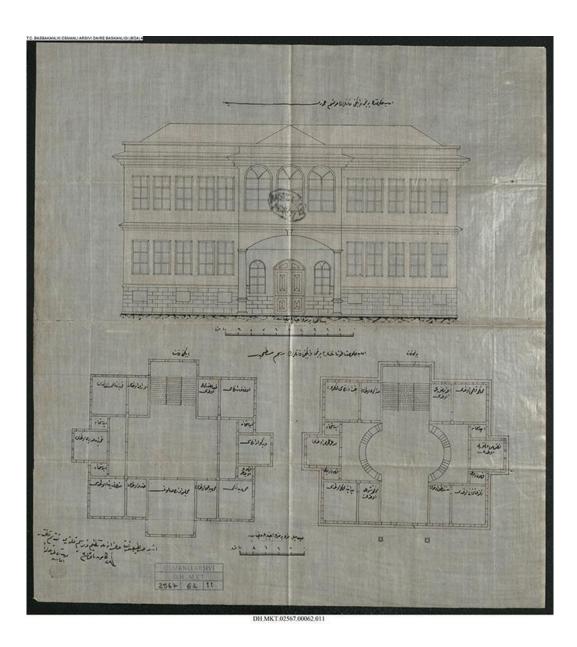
32 Front elevation and floor plans of Amasya Government Office. This building consisted of 20 rooms and a council room with three service rooms, four basement rooms, and two shops. On the first floor, there was a large room, and on the ground floor, there were two divanrooms. (OA.DH.MKT, 2567/62)
